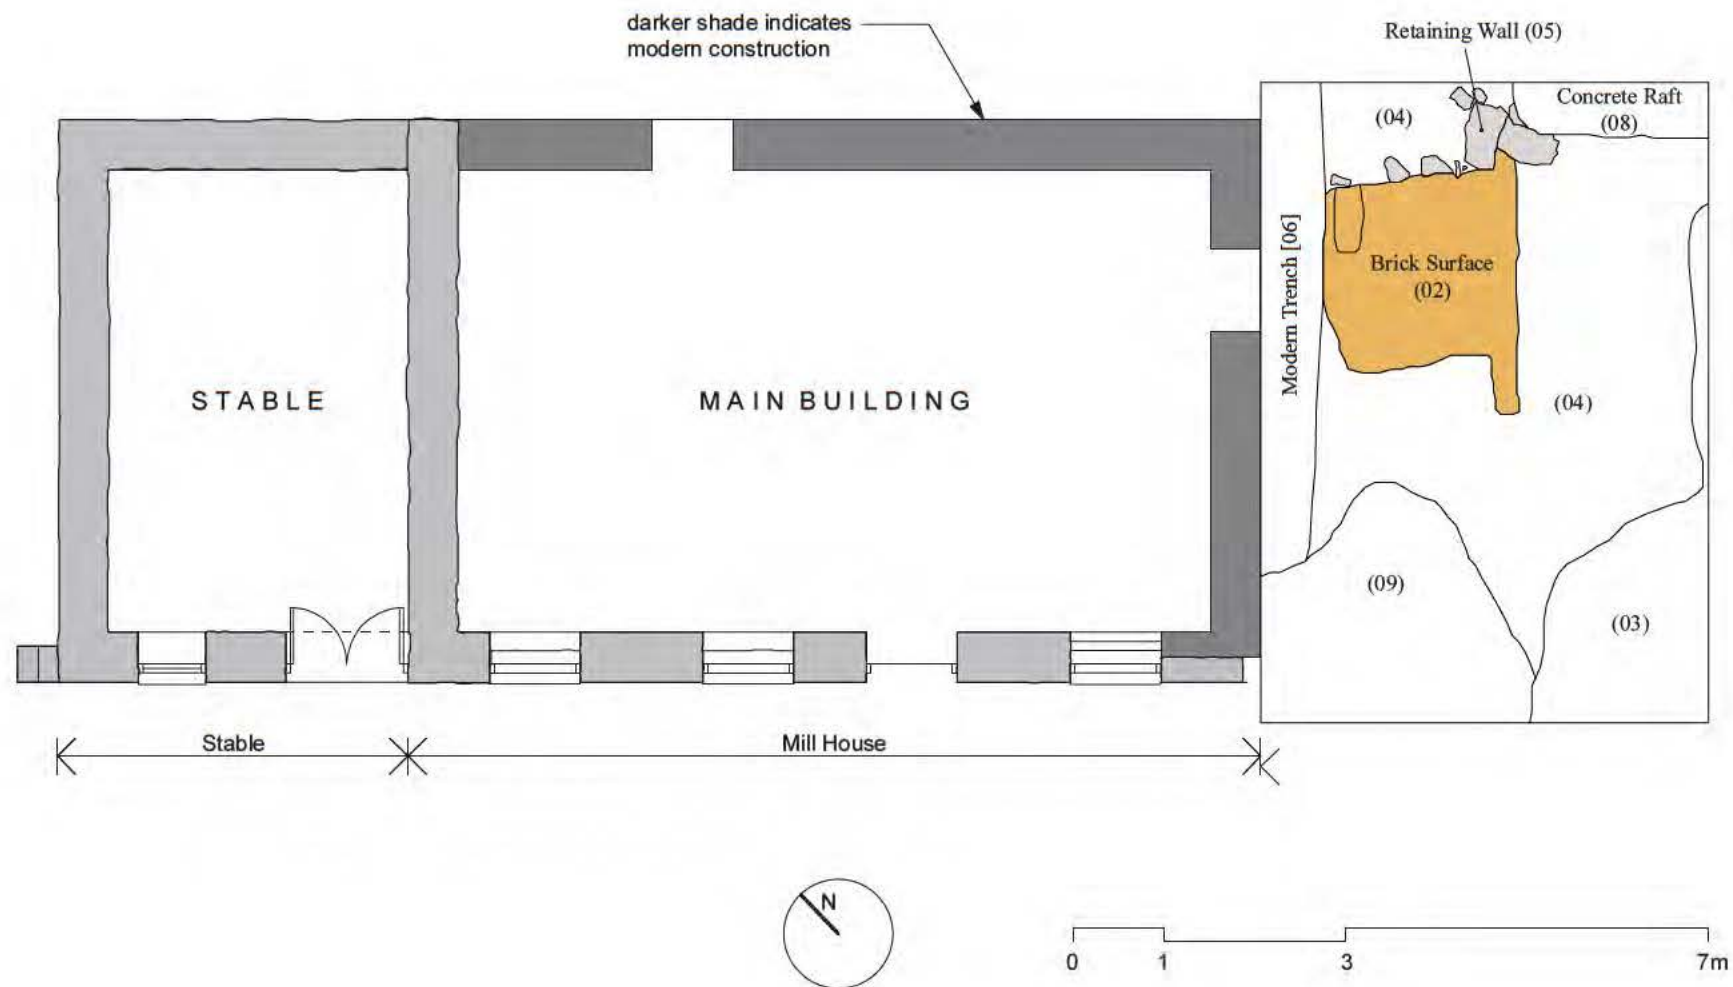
Plan of Site Showing Trench Location and Plan of Archaeological Features
